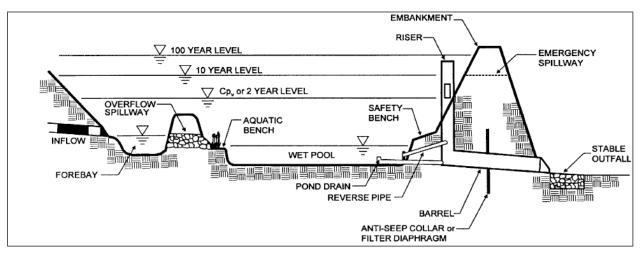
Typical Profile of Wet Pond (MDE 2000 Stormwater Design Manual)
